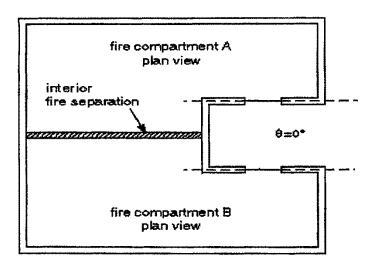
B. Openings in walls which are parallel to one another
